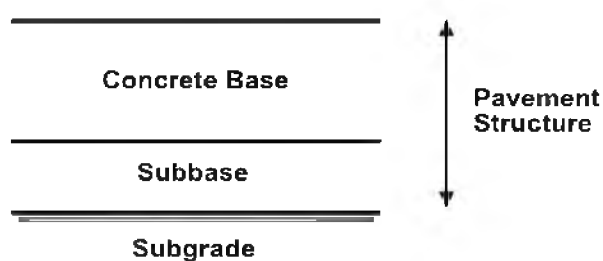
Typical Rigid Pavement Structure (Austroads 2009a)
